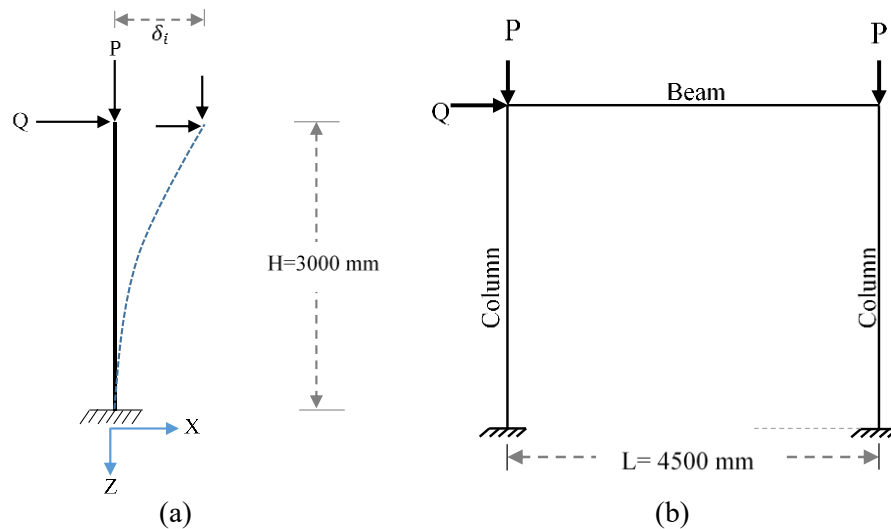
(a) Cantilever column and (b) Bare frame for numerical modelling in OpenSees.
